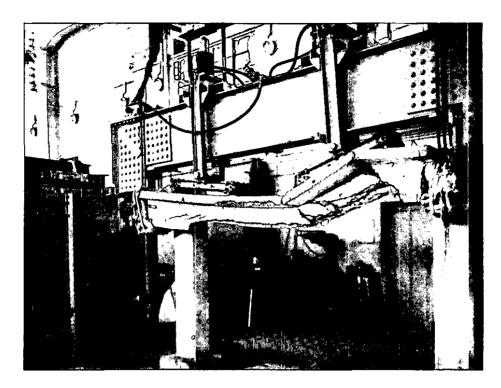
BEAMS No. 678 (A/1/2/O) AFTER TEST
